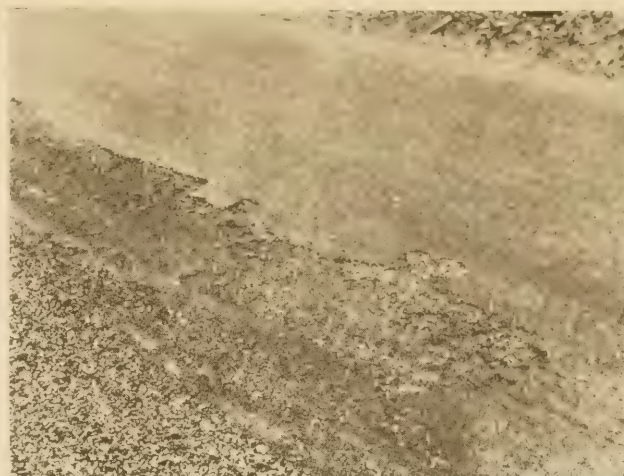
TYPICAL CRACKING AND PEELING WHICH OCCURRED DURING THE SPRING ON PORTIONS OF SECTIONS 11 AND 12, DUE TO THE BAD SUBGRADE AND POOR DRAINAGE IN THE DITCHES.
